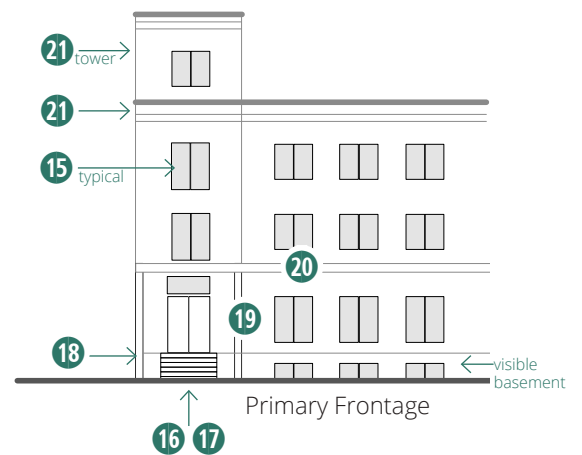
E-3. General Building: Facade Design Requirements
